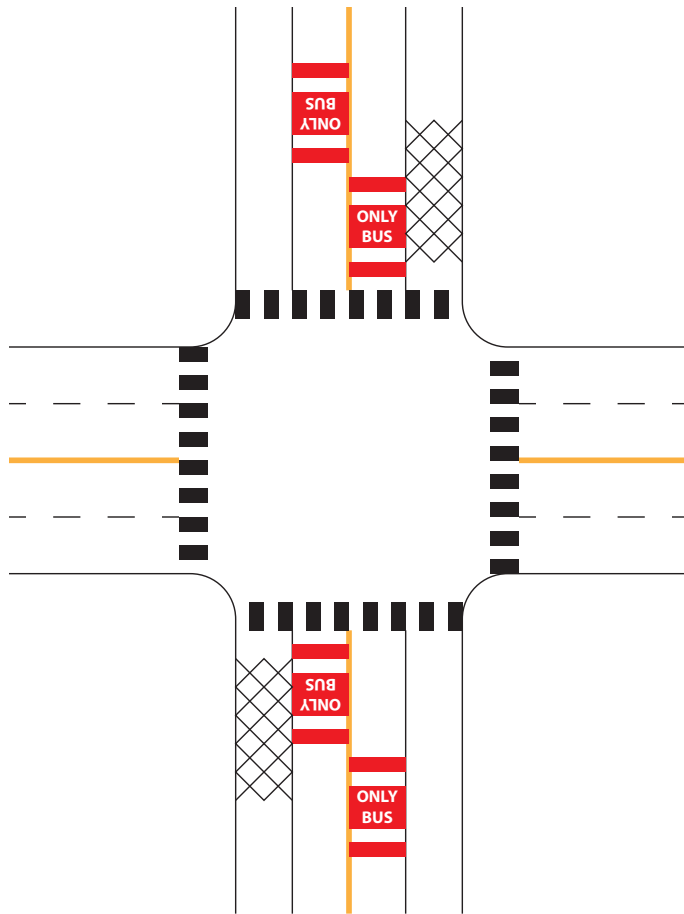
Typical Modeled Intersection With Minimum 40-Foot Road Width
